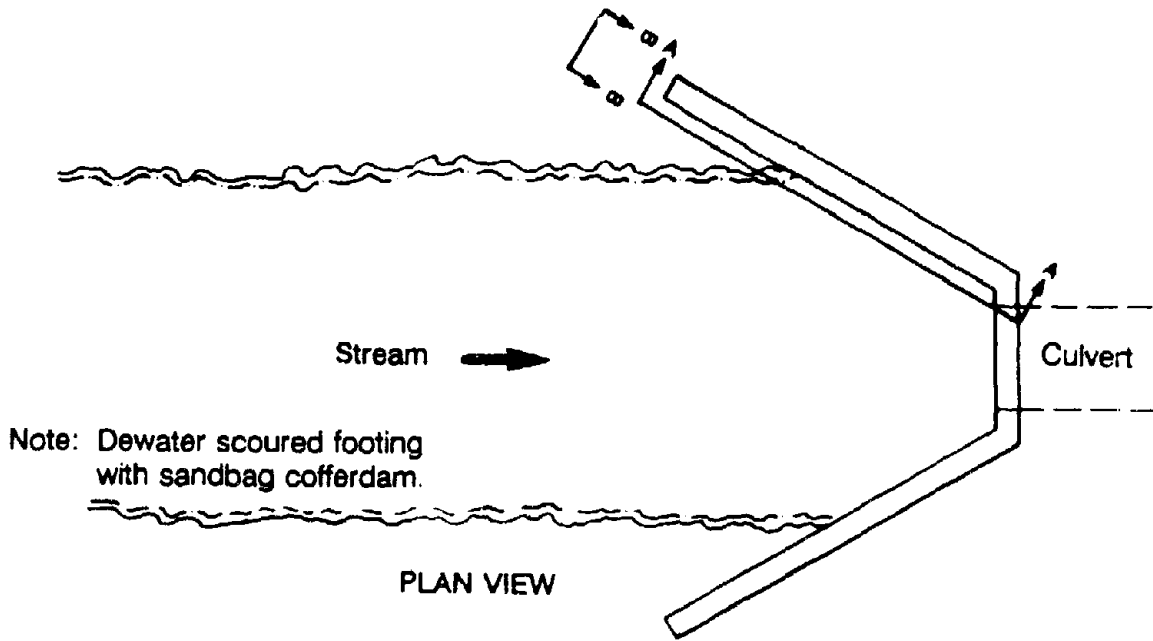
Repair of scour damaged wingwall using concrete filled bags or tubes and tremie concrete.
